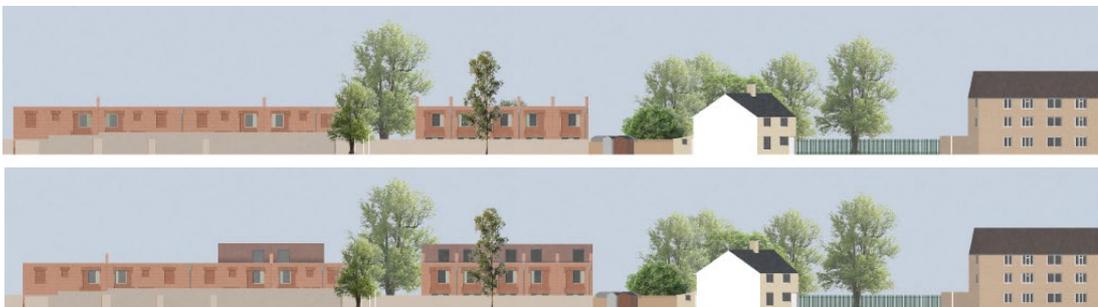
East Elevation (Top: Naked State; Bottom: Developed State)
